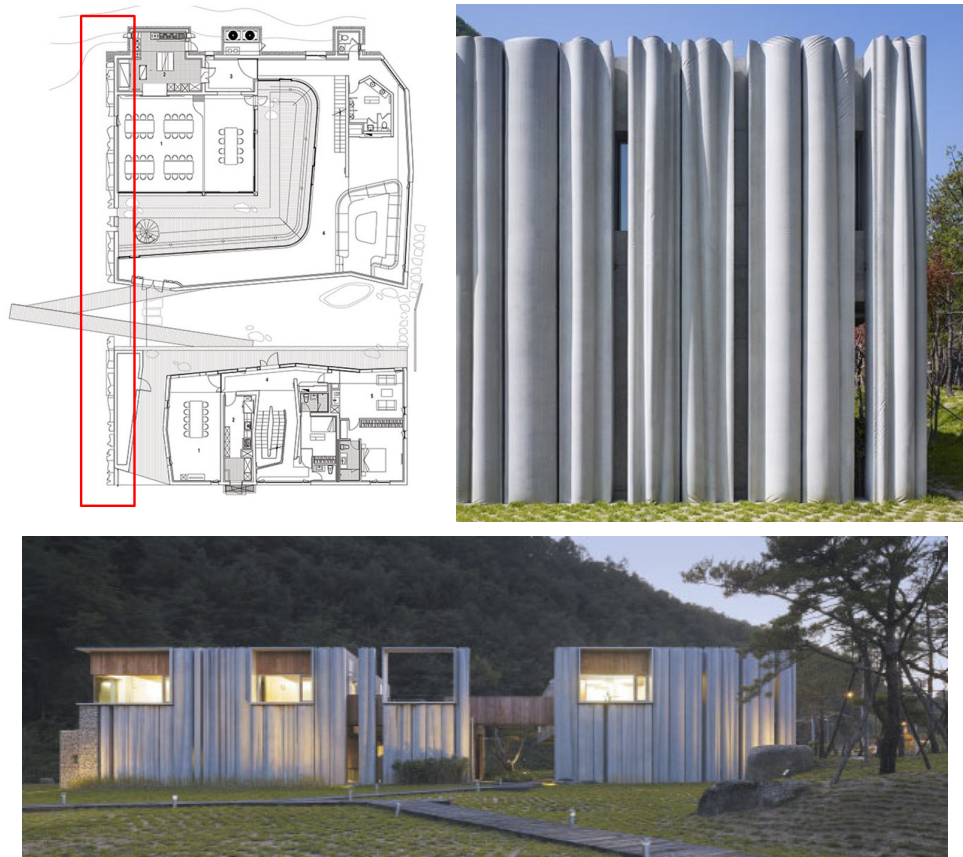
Fabric-formed tilt-up wall system in Chungbuk, Korea designed in collaboration with Mark West (© wooseop hwang)
